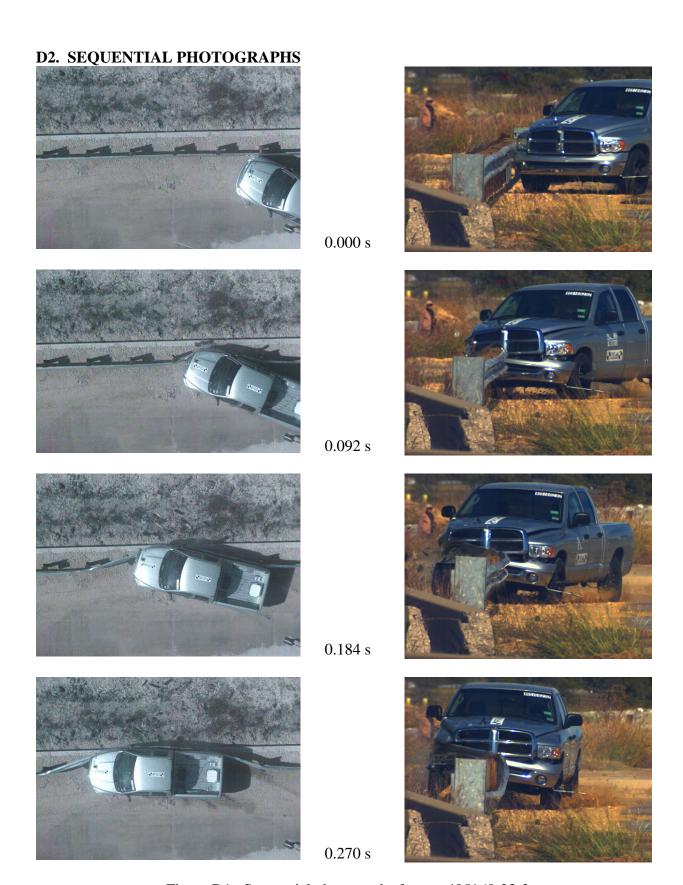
Sequential photographs for test 405160-23-2 (overhead and frontal views).
